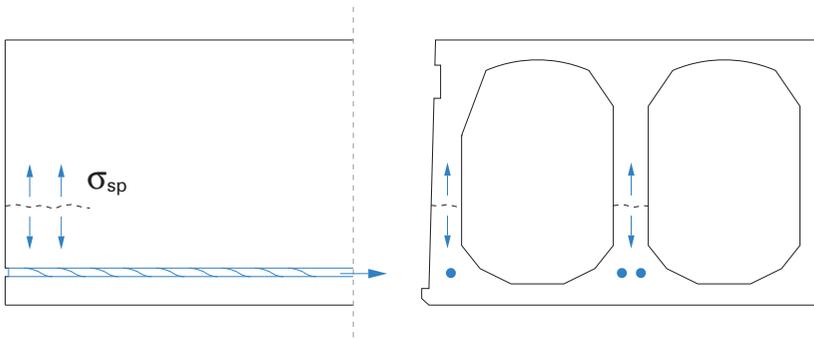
Spalling may cause lesions in the prestressed slab end
